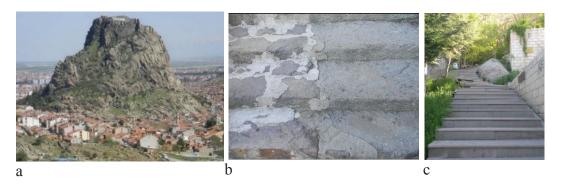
a. General view of Afyon Castle, b. The renewed and addition stairs of Afyon Castle, c. The additional stairs of Afyon Castle (Source: Köker 2020)
